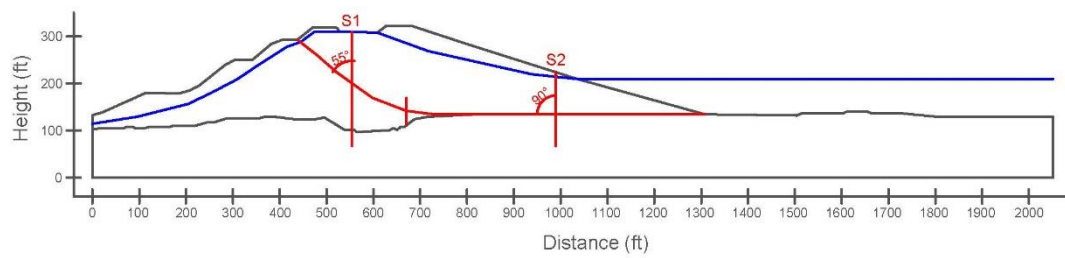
Sub-sectioning of the cross-section and failure plane for Calaveras Dam
